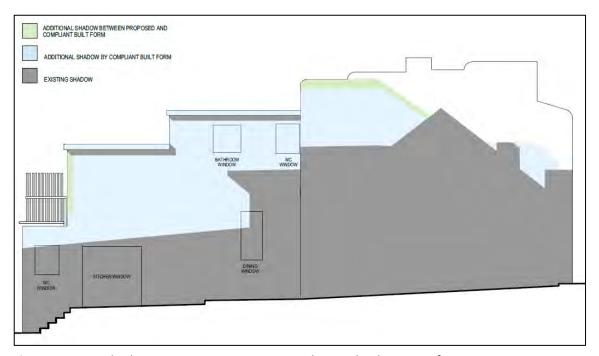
Overshadowing impacts at 9AM to northern side elevation of 12 Rawson Avenue.
